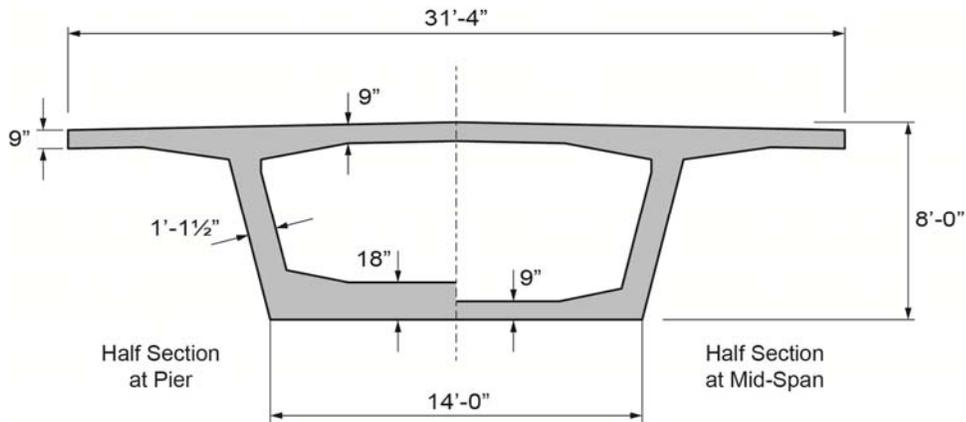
Cross Section for the 200' Span Bridge shown in Alternate 2
